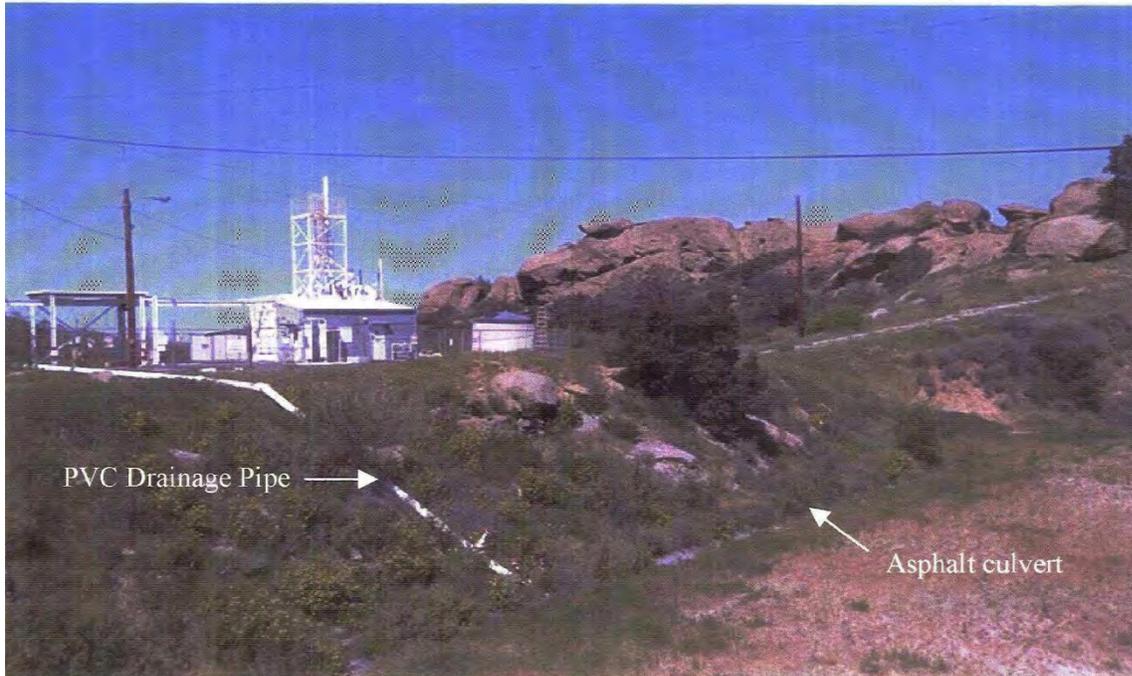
(Above): Area East of building T133, drainage line and drainage ditch looking west.
